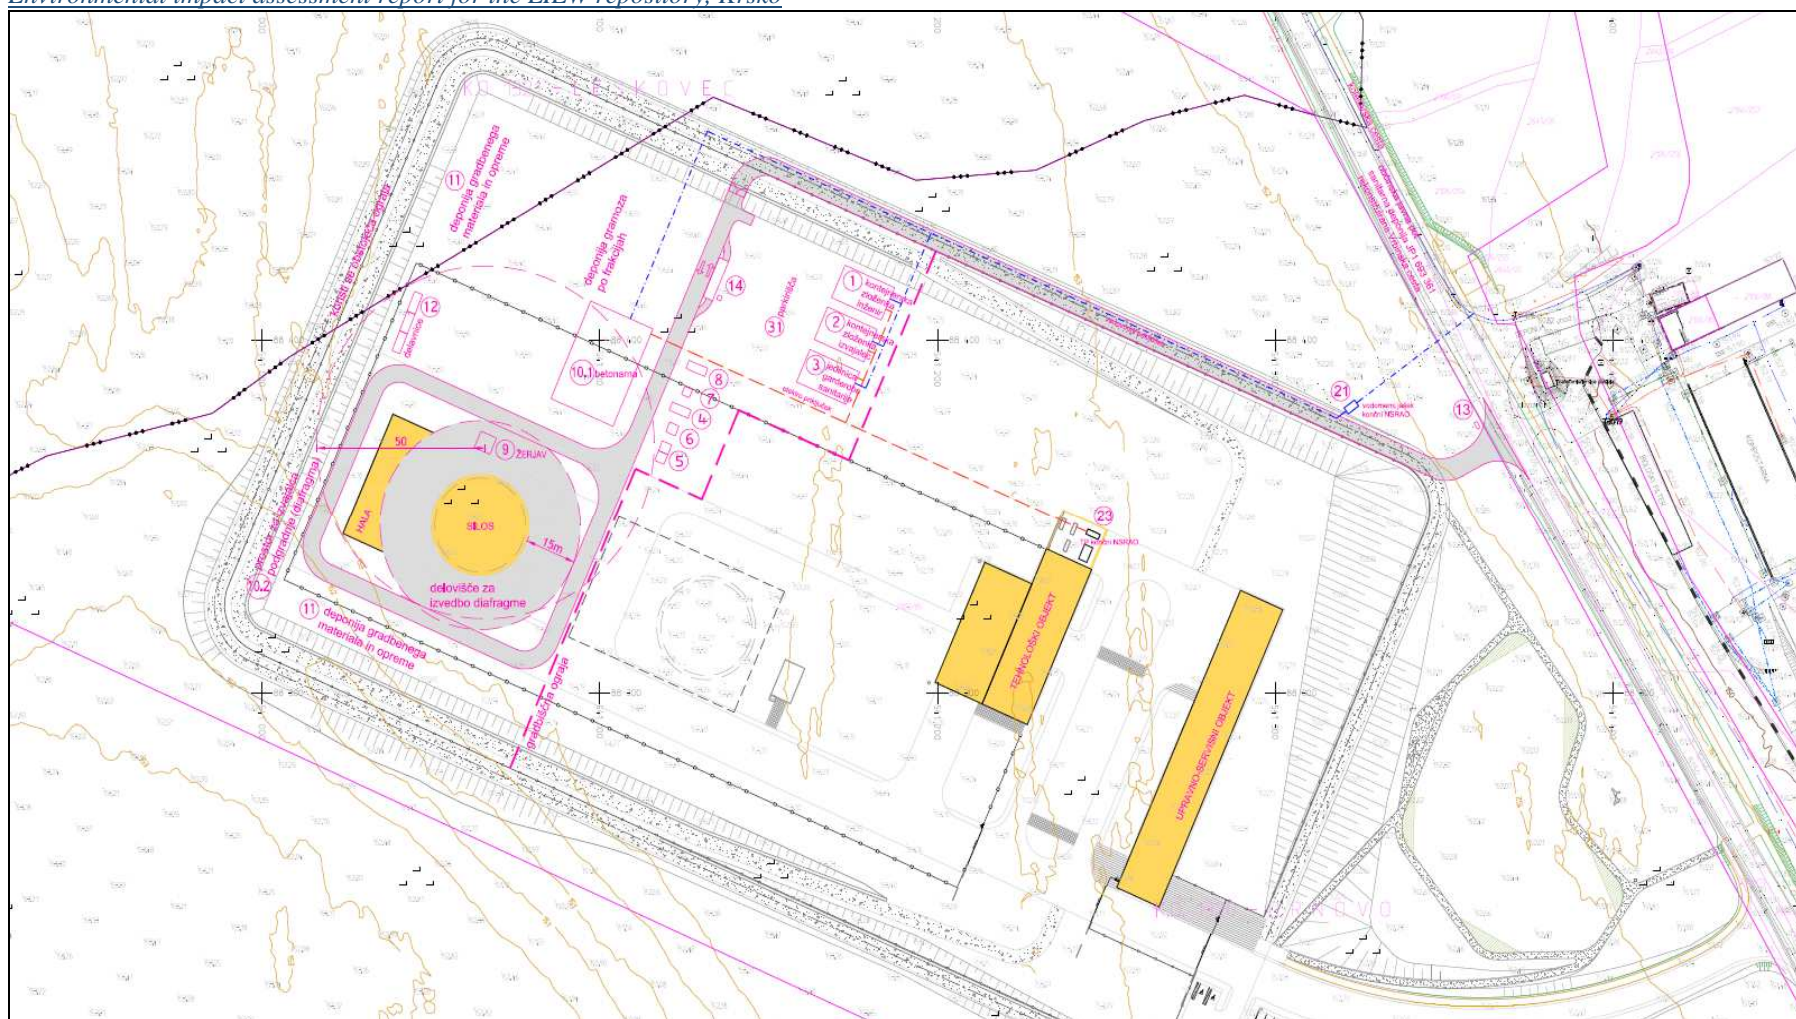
Arrangement of construction site in the phase of constructing the second silo
